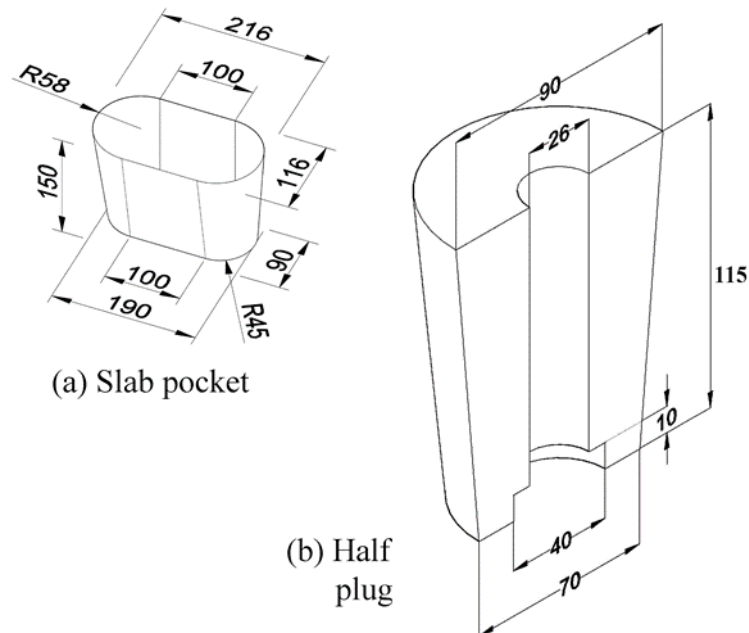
Dimensions of (a) slab pocket and (b) half plug for LNSC
